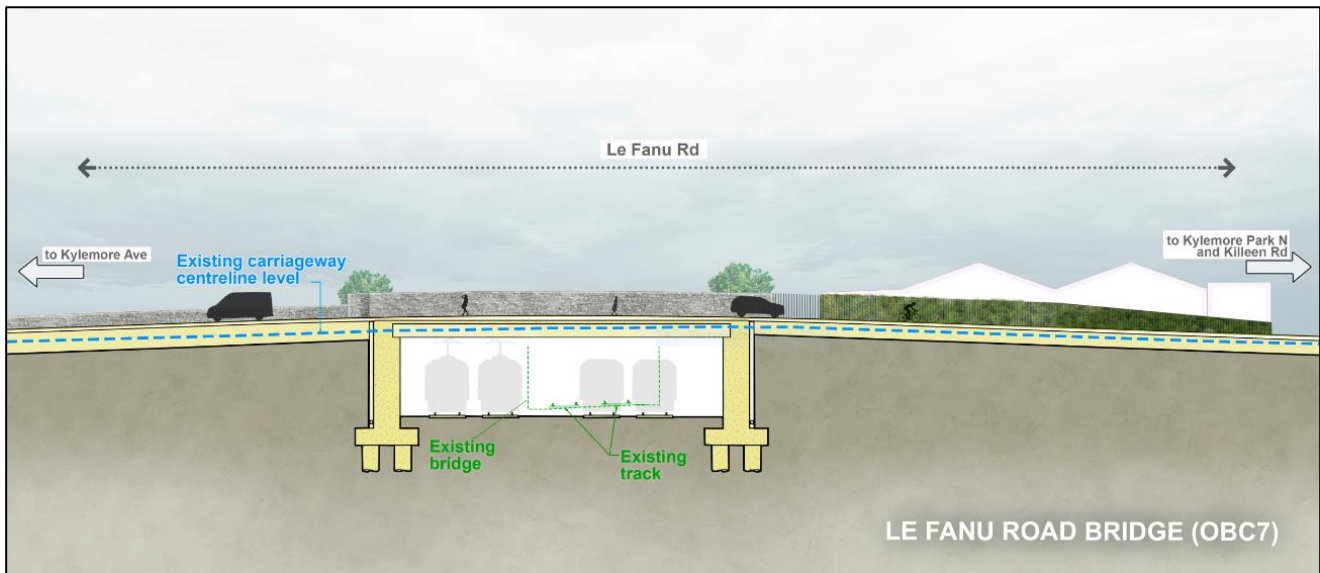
Emerging Preferred Option for Le Fanu Road Bridge (OBC7)
